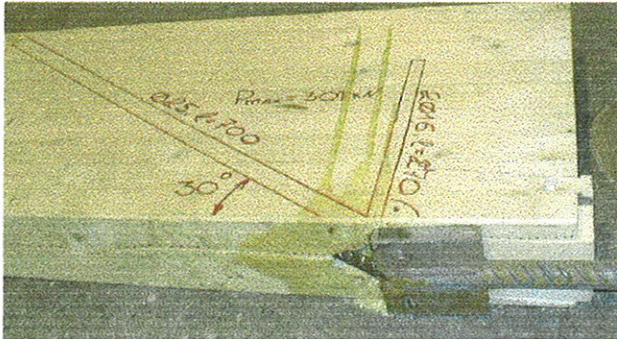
Test specimen 25+2D16 after failure at 302 kN
